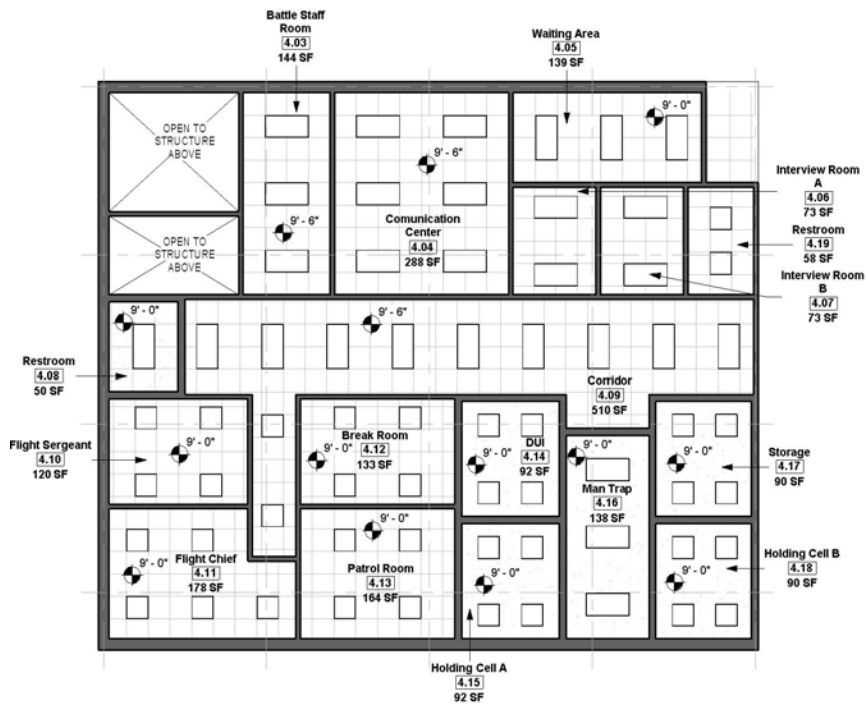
Module 4: ECC/ BDOC – Reflected Ceiling Plan
